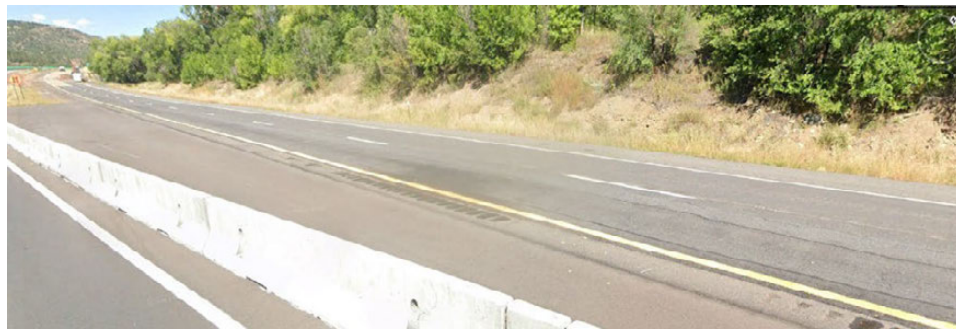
Photo. Fugro and Google® Earth™ Street View images; MP 453.8, I-25 northbound inverted pavement, Colfax County, New Mexico (Fugro images provided by New Mexico DOT).
